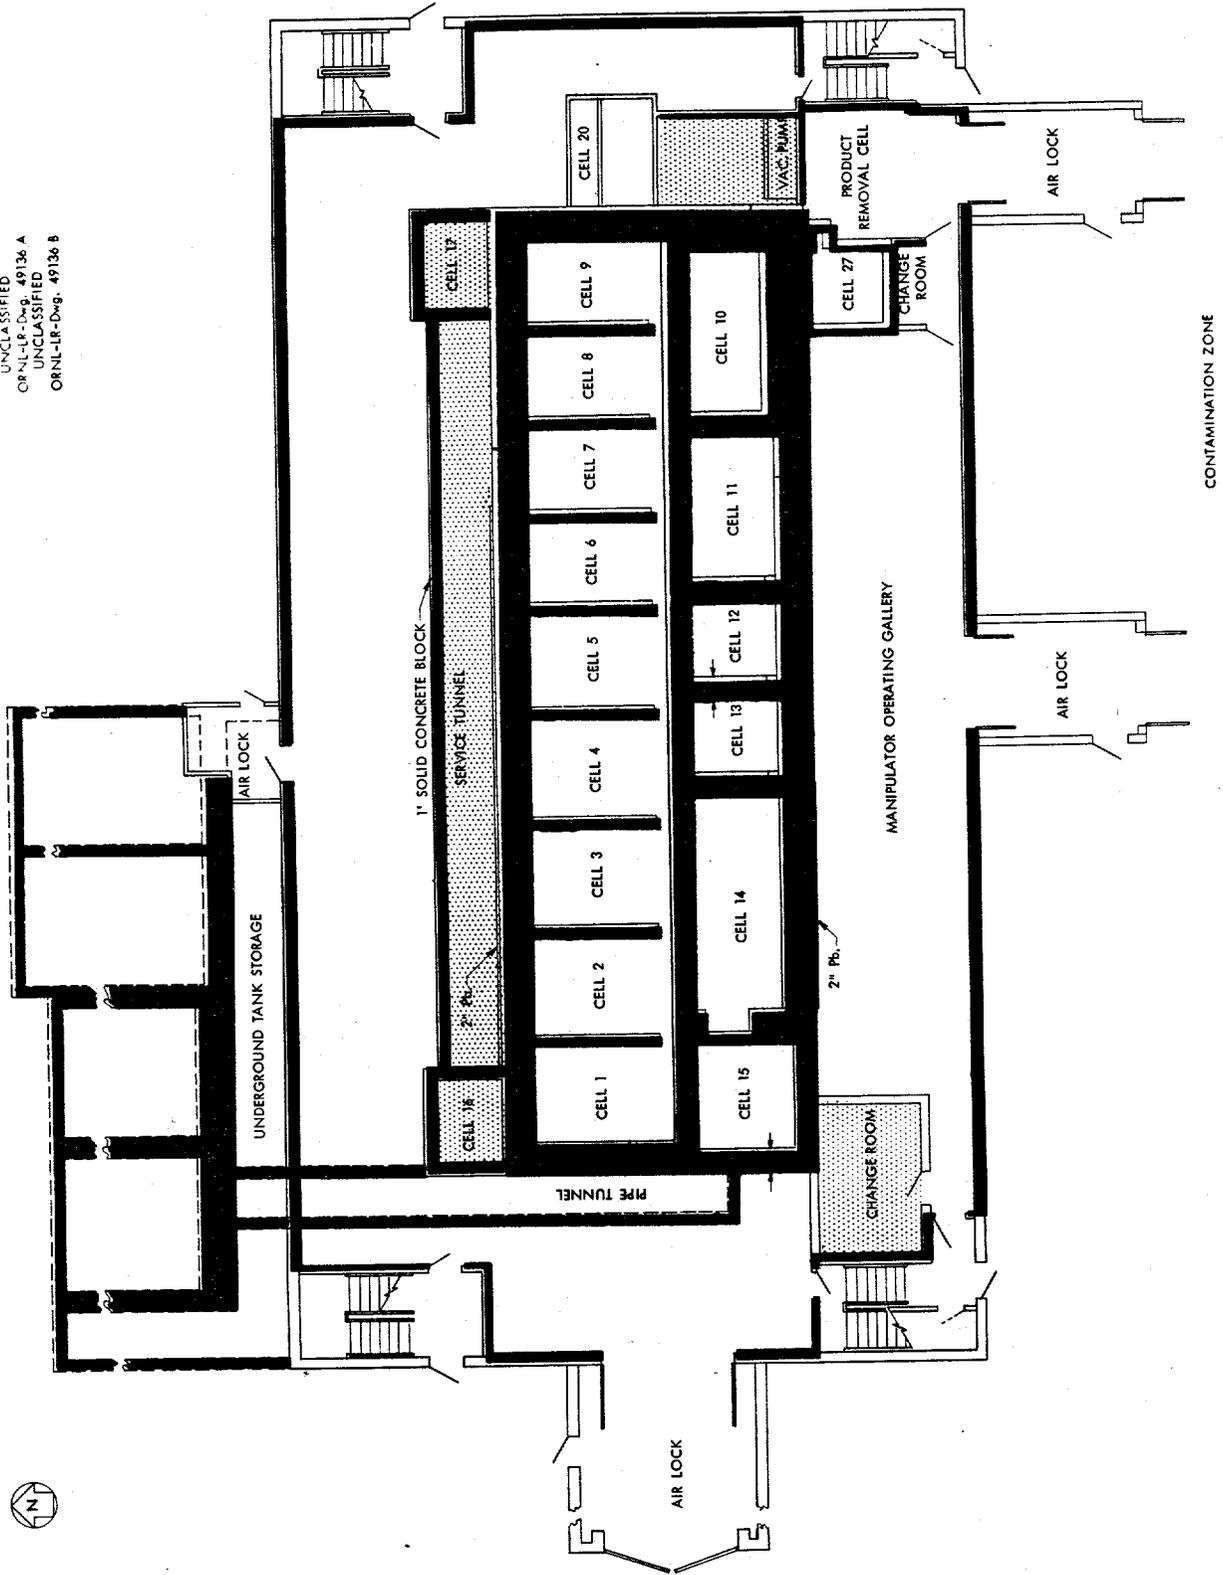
BLDG. 3517 FIRST FLOOR PLAN
